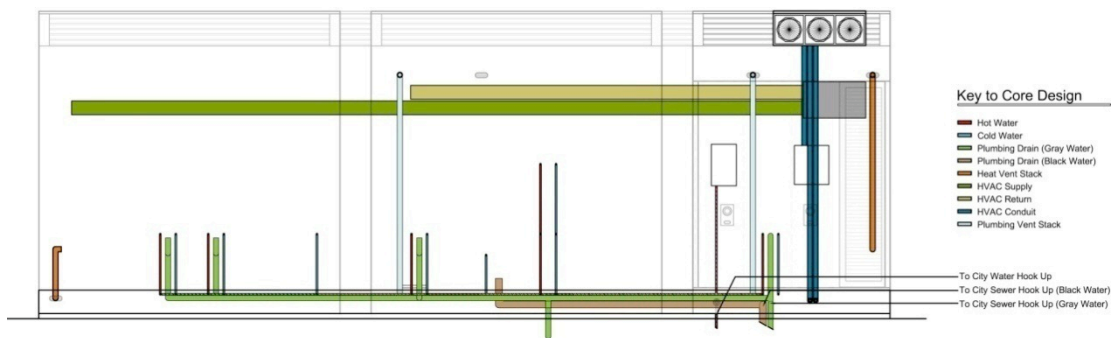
Building services are mapped over exterior elevation. (Young, 2007)
